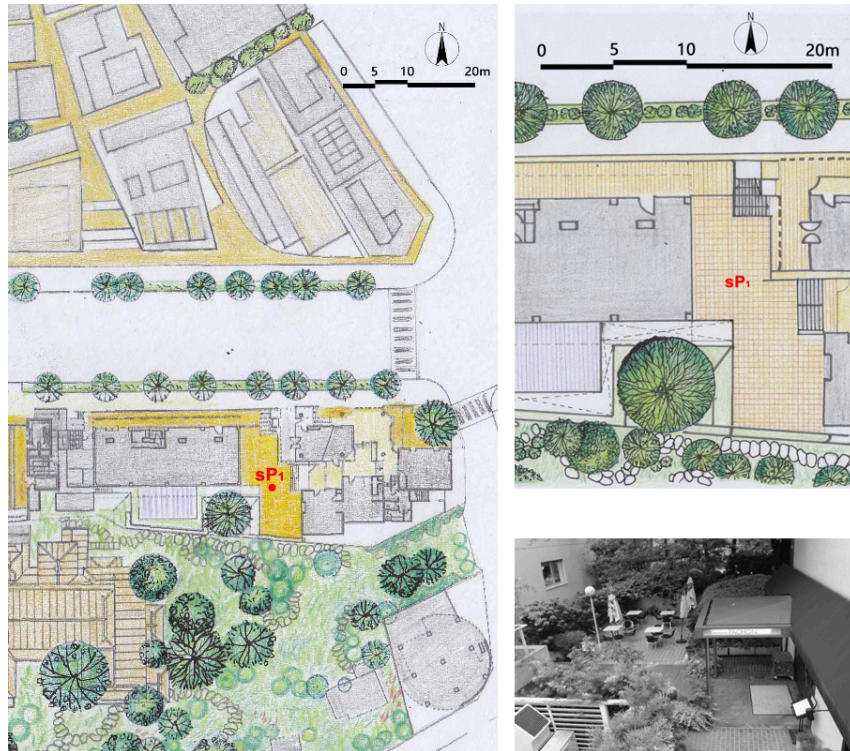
The sunken plaza (sP) behind Building B. (Source from: drawing and photo from the author)
